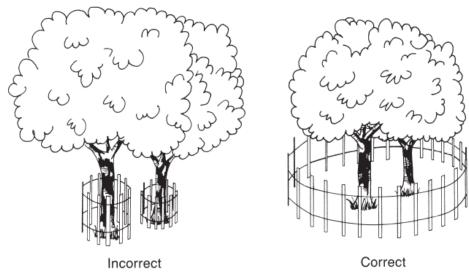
A: Construction barriers should be installed at the drip line of the tree branches. Source: NCDEQ (2013).
